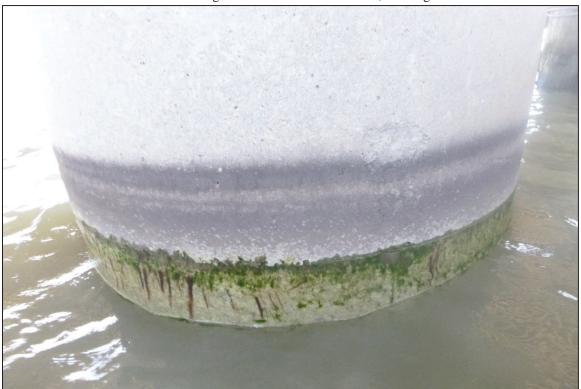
View of the South Face of Bent 22, Looking Northeast.
